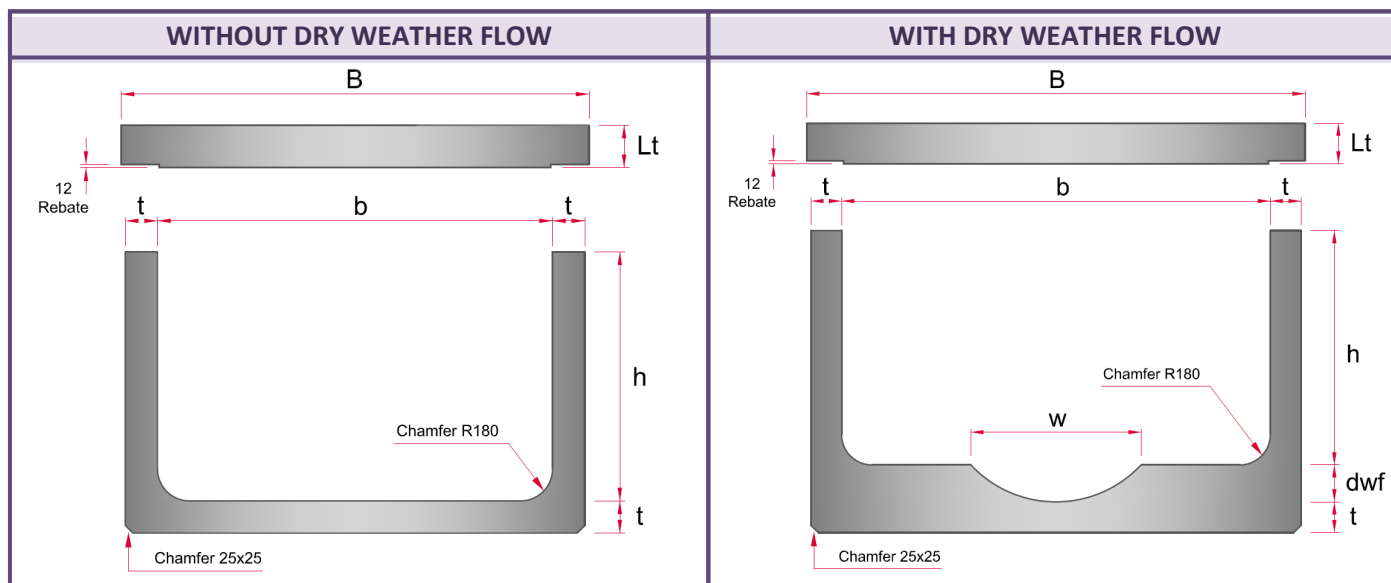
DETAILS OF OKA STANDARD SIZE BOX CULVERT
